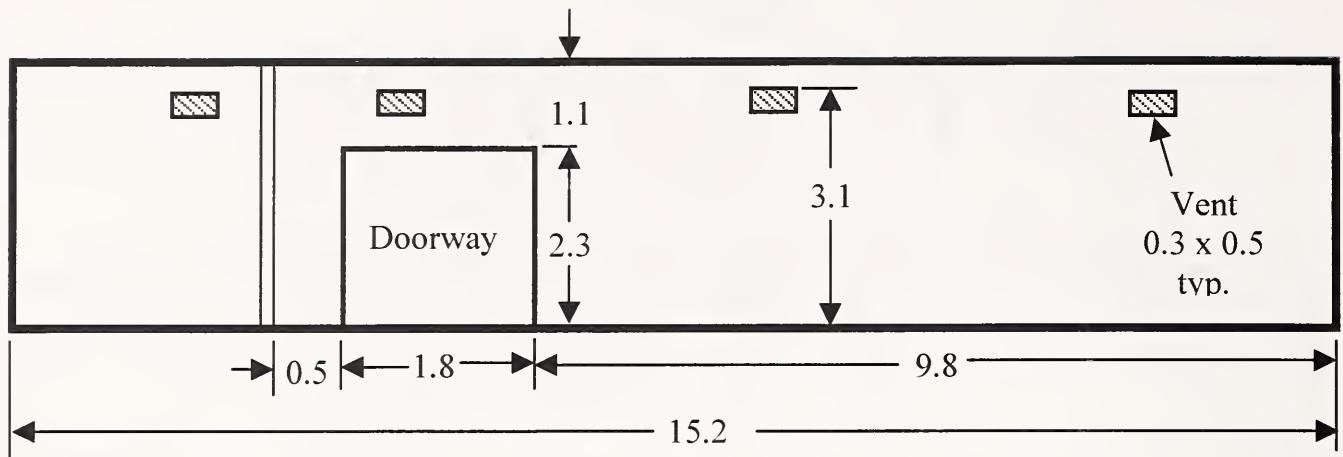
Elevation view of wall dividing the two areas used for the first test (dimensions in meters).
